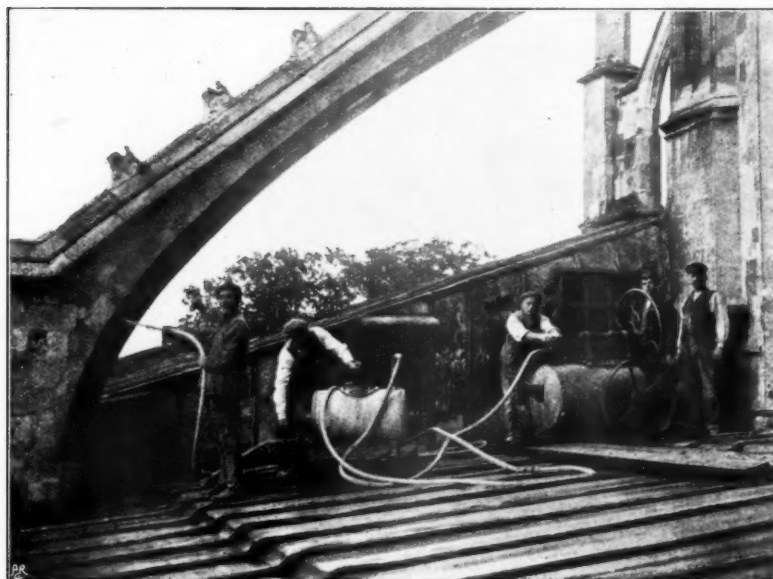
WINCHESTER CATHEDRAL: THE GROUTING MACHINE AT WORK ON THE ROOF.
